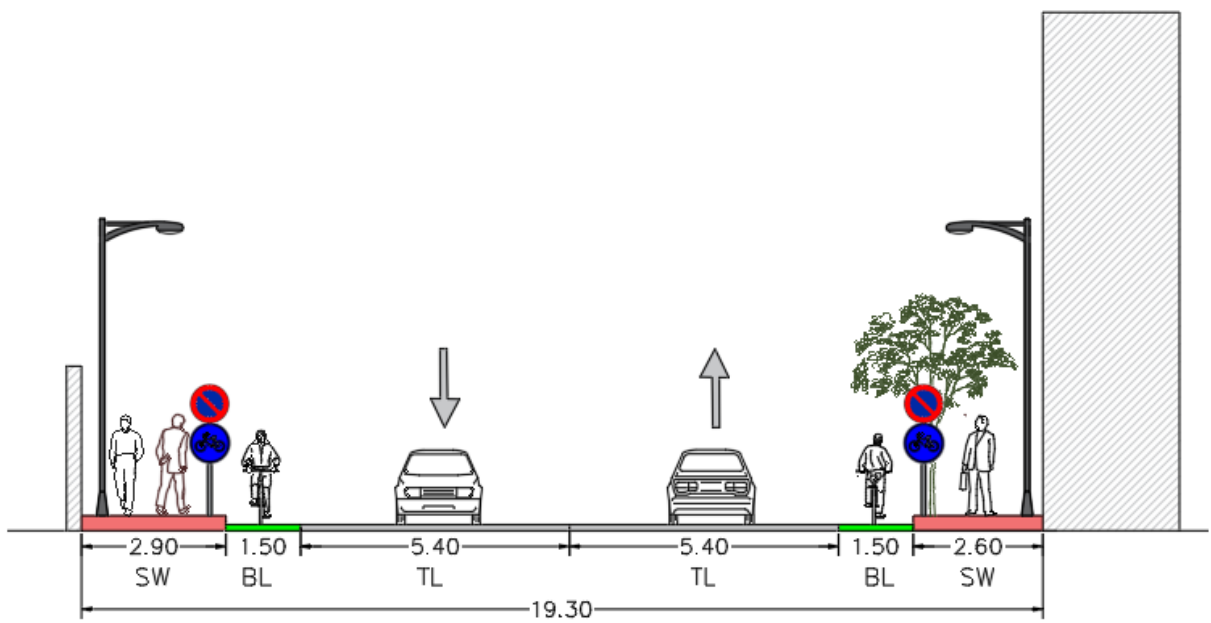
9: Typical Cross Section B-B, Rafidia Street
